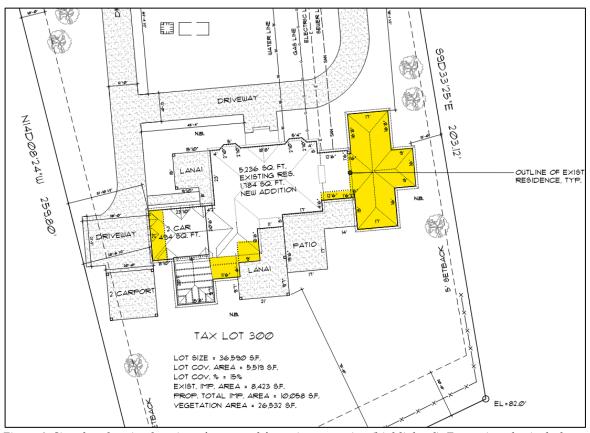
Site plan showing location of proposed footprint expansion (highlighted). Expansion also includes the addition of two lanais (not highlighted but labeled).
